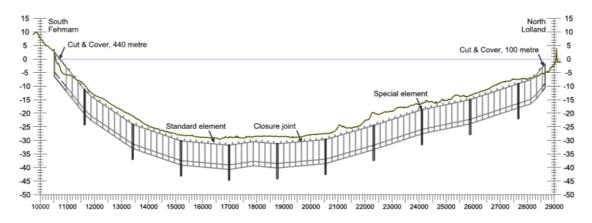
Vertical tunnel alignment showing depth below sea level
